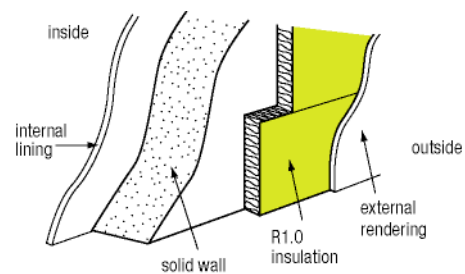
Solid masonry or concrete panel wall with external insulation (overall R value 1.4)
